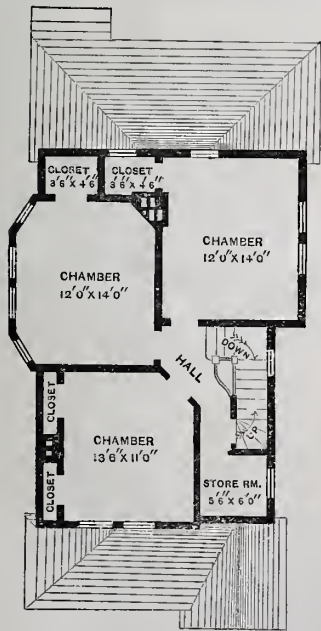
Second Floor Plan.—Scale, $\frac{1}{16}$ Inch to the Foot.
